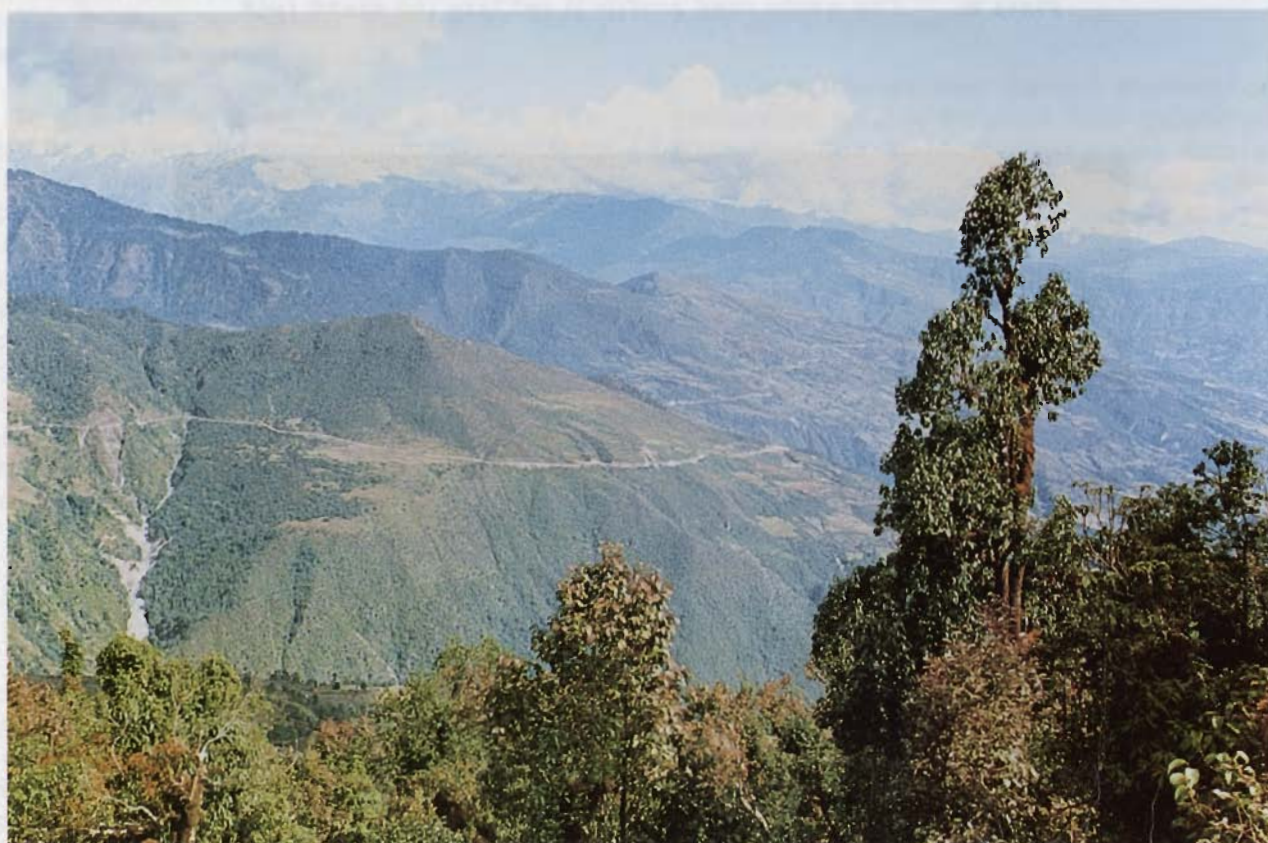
The road section between Kharidhunga Pass and Hanumante Pass.
